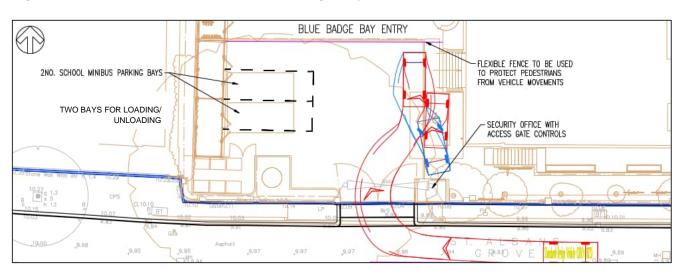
Permitted Site Plan - Blue Badge Bay
